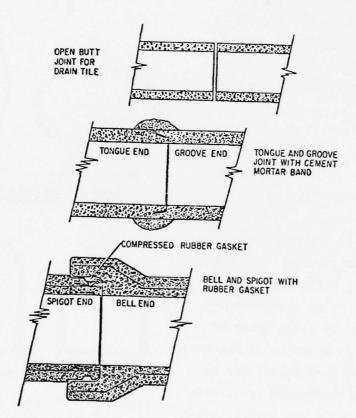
Typical concrete pipe joints (courtesy of McGraw-Hill Book Company)
